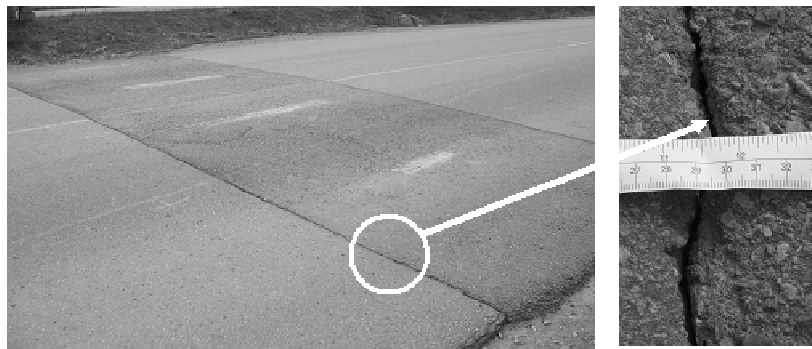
Distress at the location of the open-cut installed pipe installed
